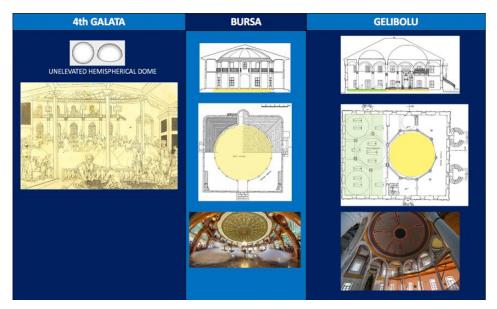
(a) 4 th Galata-Picture [8] (b) Bursa- Section and plan drawings [1], Photo [7] (c) Gelibolu- Section and plan drawings [1], Photo [7]
